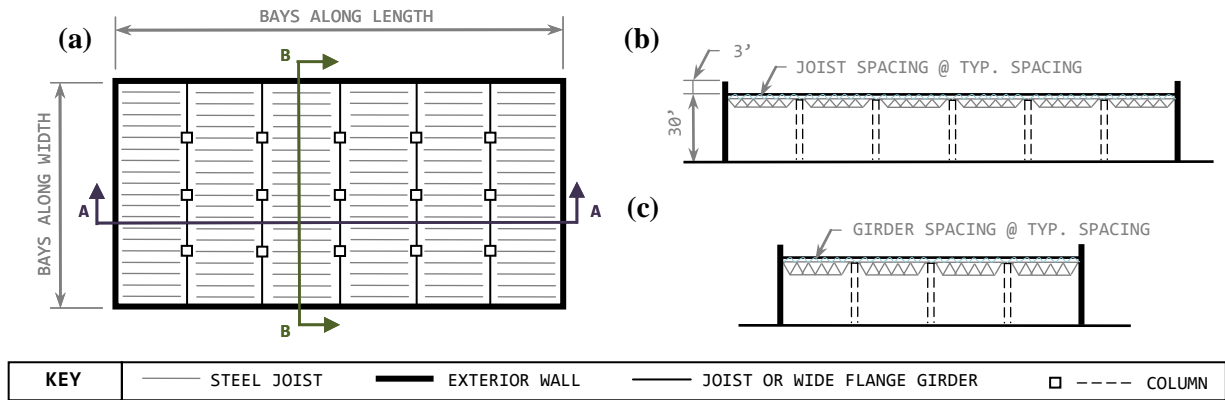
(a) Plan view, (b) front elevation view (section A-A), and (c) side elevation view (section B-B) depicting typical lightweight metal building design characteristics.
